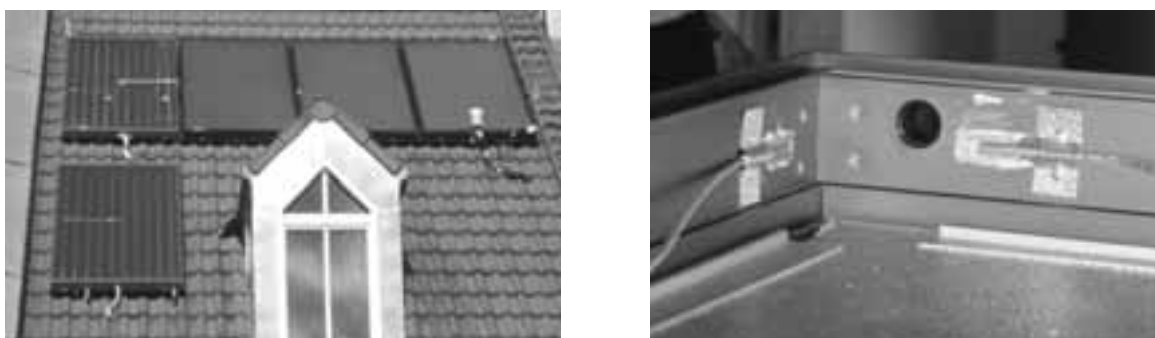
Field-Testing of Collectors (left) and Exemplary Temperature Measurement Equipment at a Collector Casing (right)
